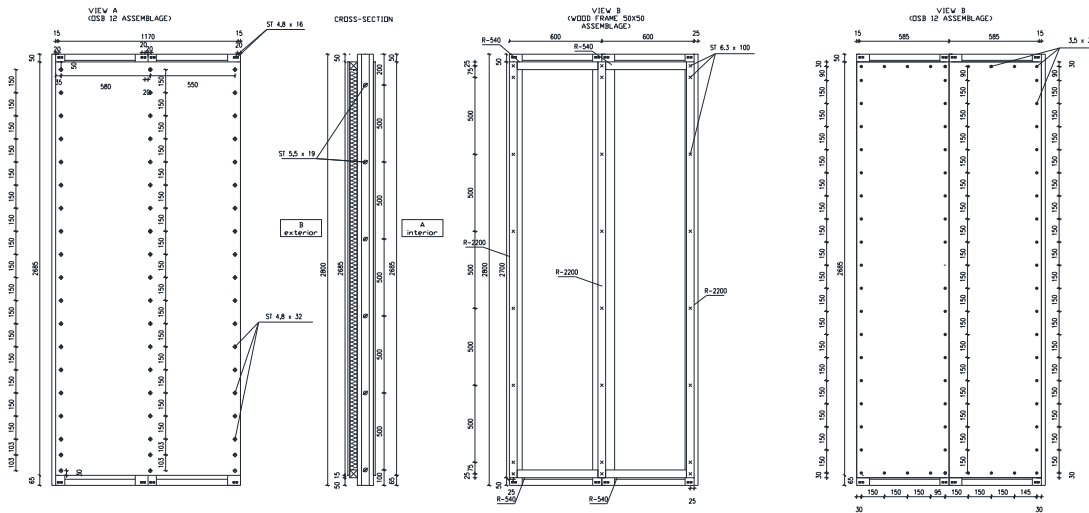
Frame braced by OSB with steel frame connection spacing – 150 mm.
